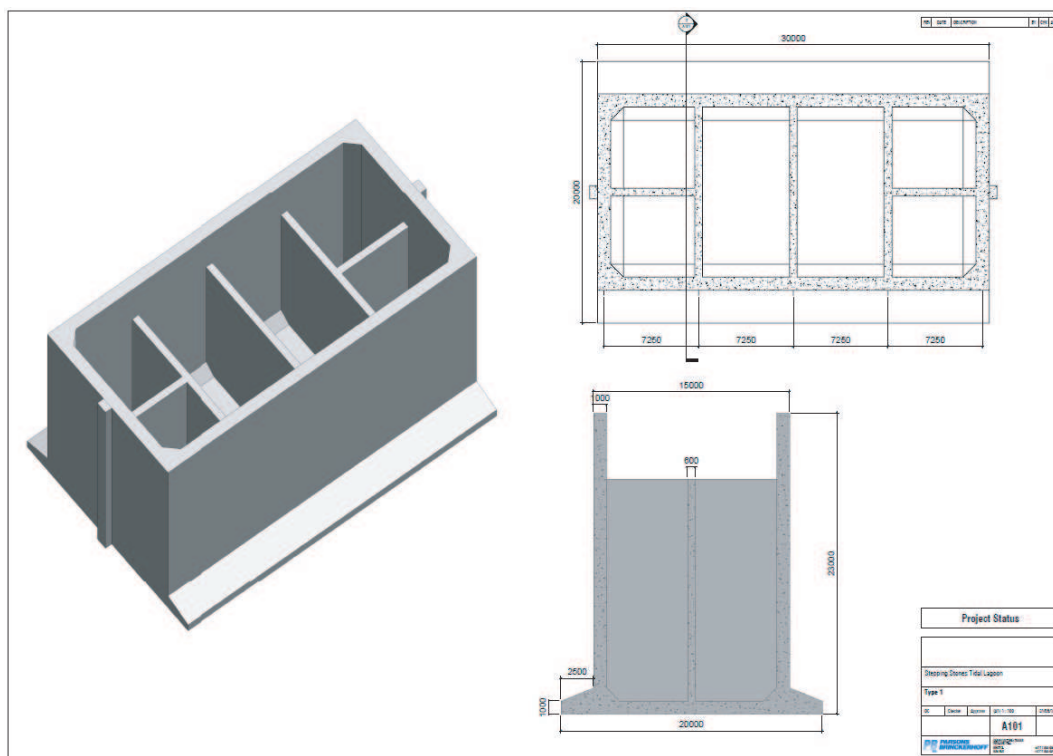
Typical form of concrete caisson construction used to form impounding wall.
